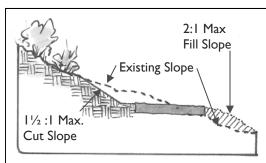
A Full Bench Trail, placed on cut portion of the slope only, provides a more stable base than a trail placed on fill material.
